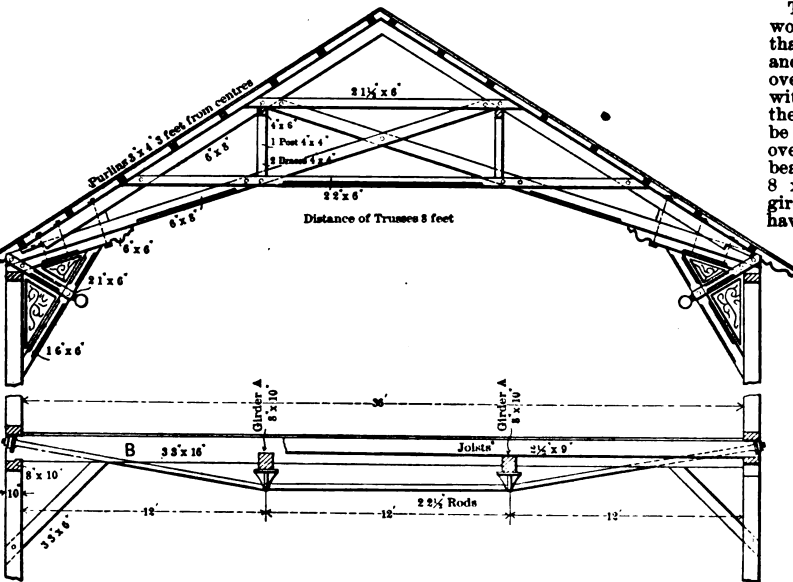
Section Through the Building.—Scale, 1/4 Inch to the Foot.
